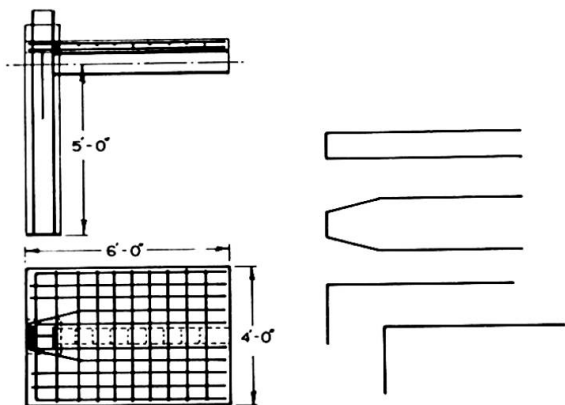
COMPOSITE CONNECTION REINFORCEMENT DETAILS
